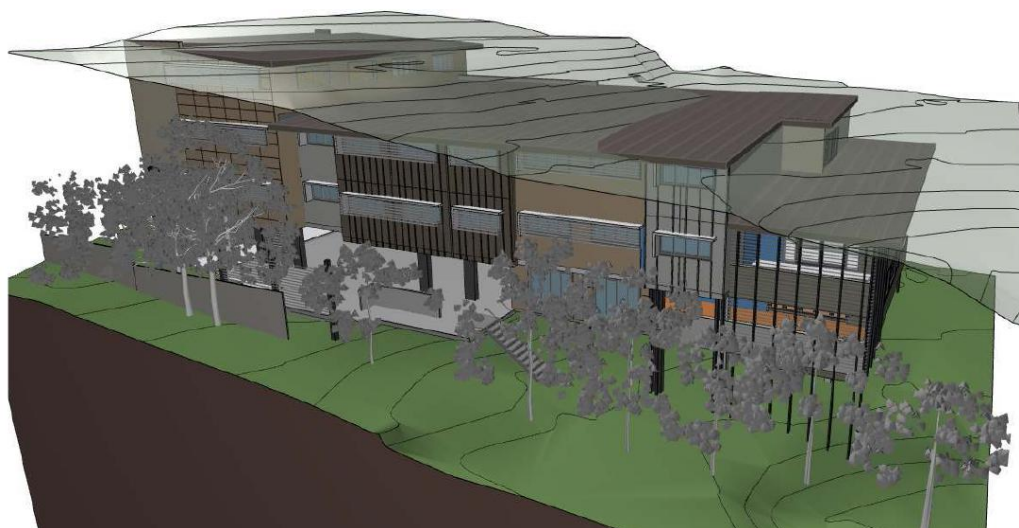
Perspective of the proposed development as viewed from the south west demonstrating that the roof form is the only portion of the development which exceeds the height standard. Source: Architectural Plans Elevation Architecture
